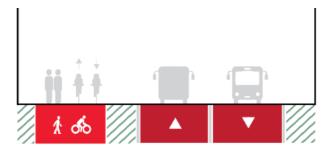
Typical Cross section – Rural Rapid Transit Corridor
